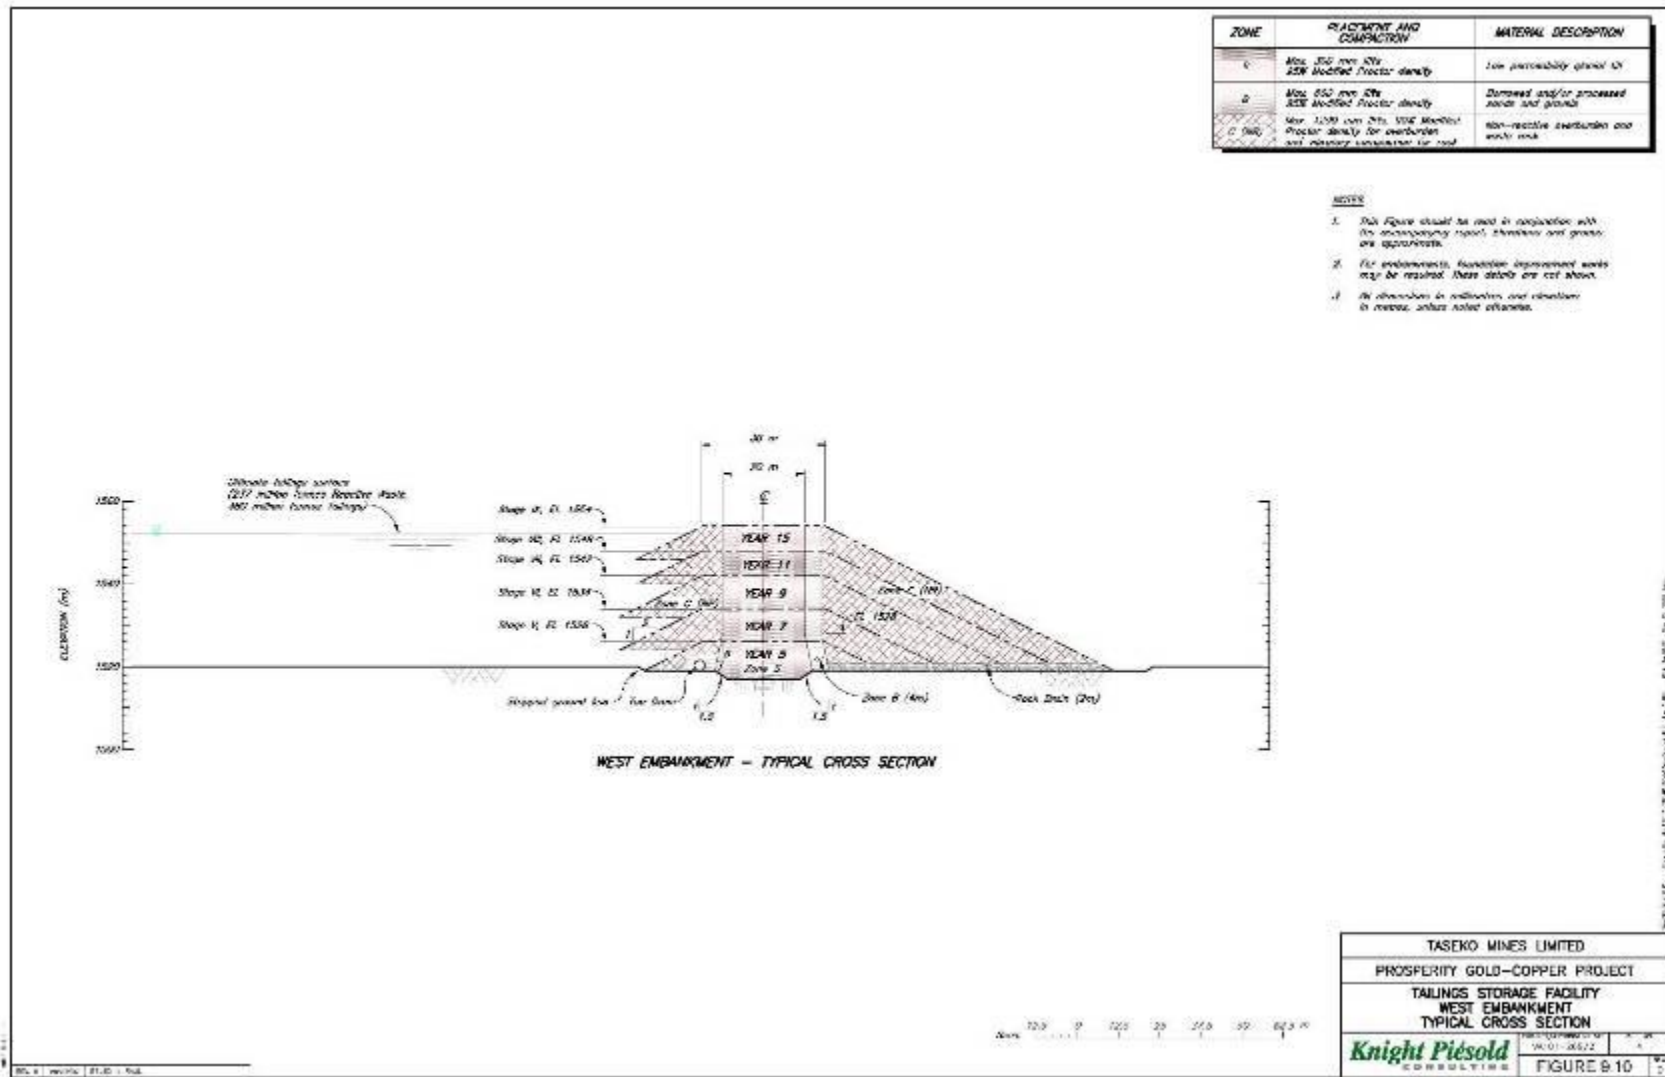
Tailings Storage Facility–West Embankment Typical Cross Section
